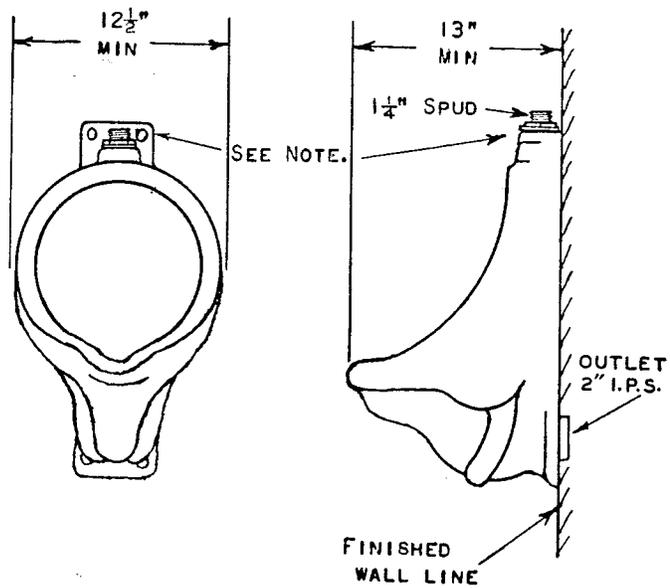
WALL-HANGING SIPHON-JET URINAL. (PAR. 4.3.1.)
